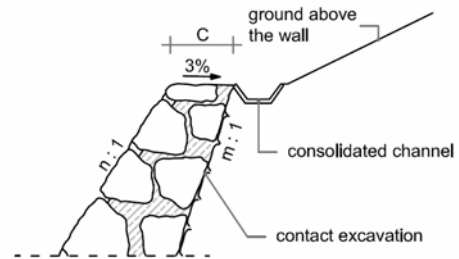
Detail of the crown of a stone gravity retaining wall
